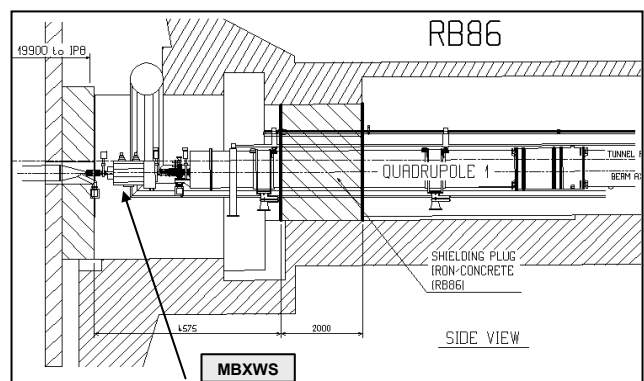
MBXWS, Q1 and shielding plug in RB86 [2].
